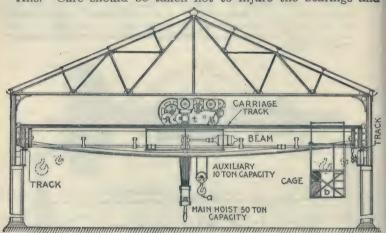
Cross section of electrical station showing a traveling crane for the installation or removal of large and heavy machine parts. A traveling crane consists of an iron beam which, being supplied with wheels at the ends, can be made to move either mechanically or electrically upon a track running the entire length of the station. This track is not supported by the walls of the building, but rests upon beams specially provided for the purpose. In addition to the horizontal motion thus obtained, another horizontal motion at right angles to the former is afforded by means of the carriage which, being also mounted on wheels, runs upon a track on the top of the beam. Electrical power is generally used to move the carriage and also the revolving drums contained thereon, the latter of which give a vertical motion to the main hoist or the auxiliary hoist, these hoists being used respectively for raising or lowering heavy or light loads. In the larger sizes of electric traveling crane, a cage is attached to the beam for the operator, who, by means of three controllers mounted in the cage, can move a load on either the main or auxiliary hoist in any direction.
